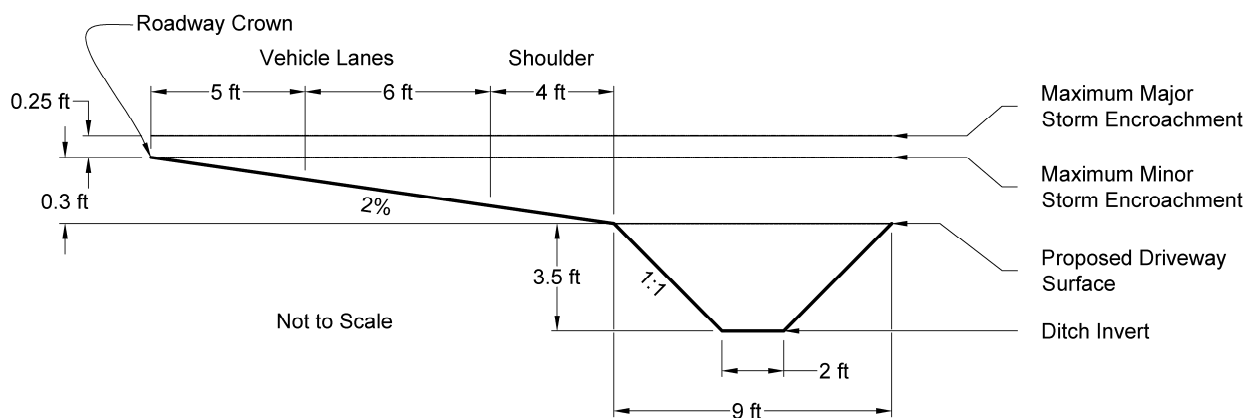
Private Driveway Culvert Example Ditch Geometry.
